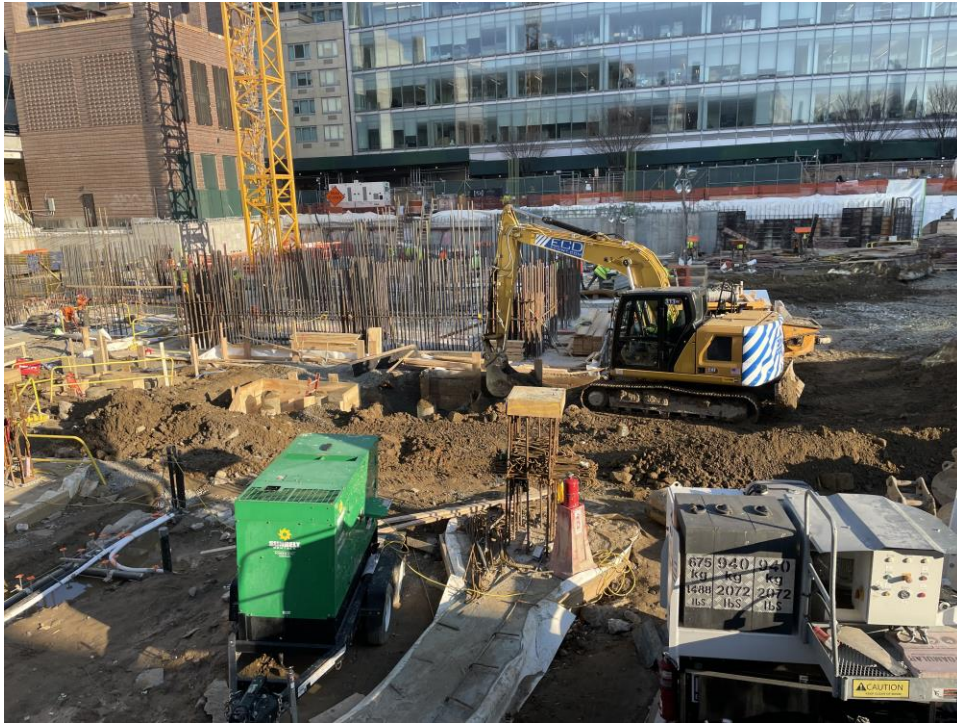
ECD excavating in the western part of the site (WCG B, facing east).
